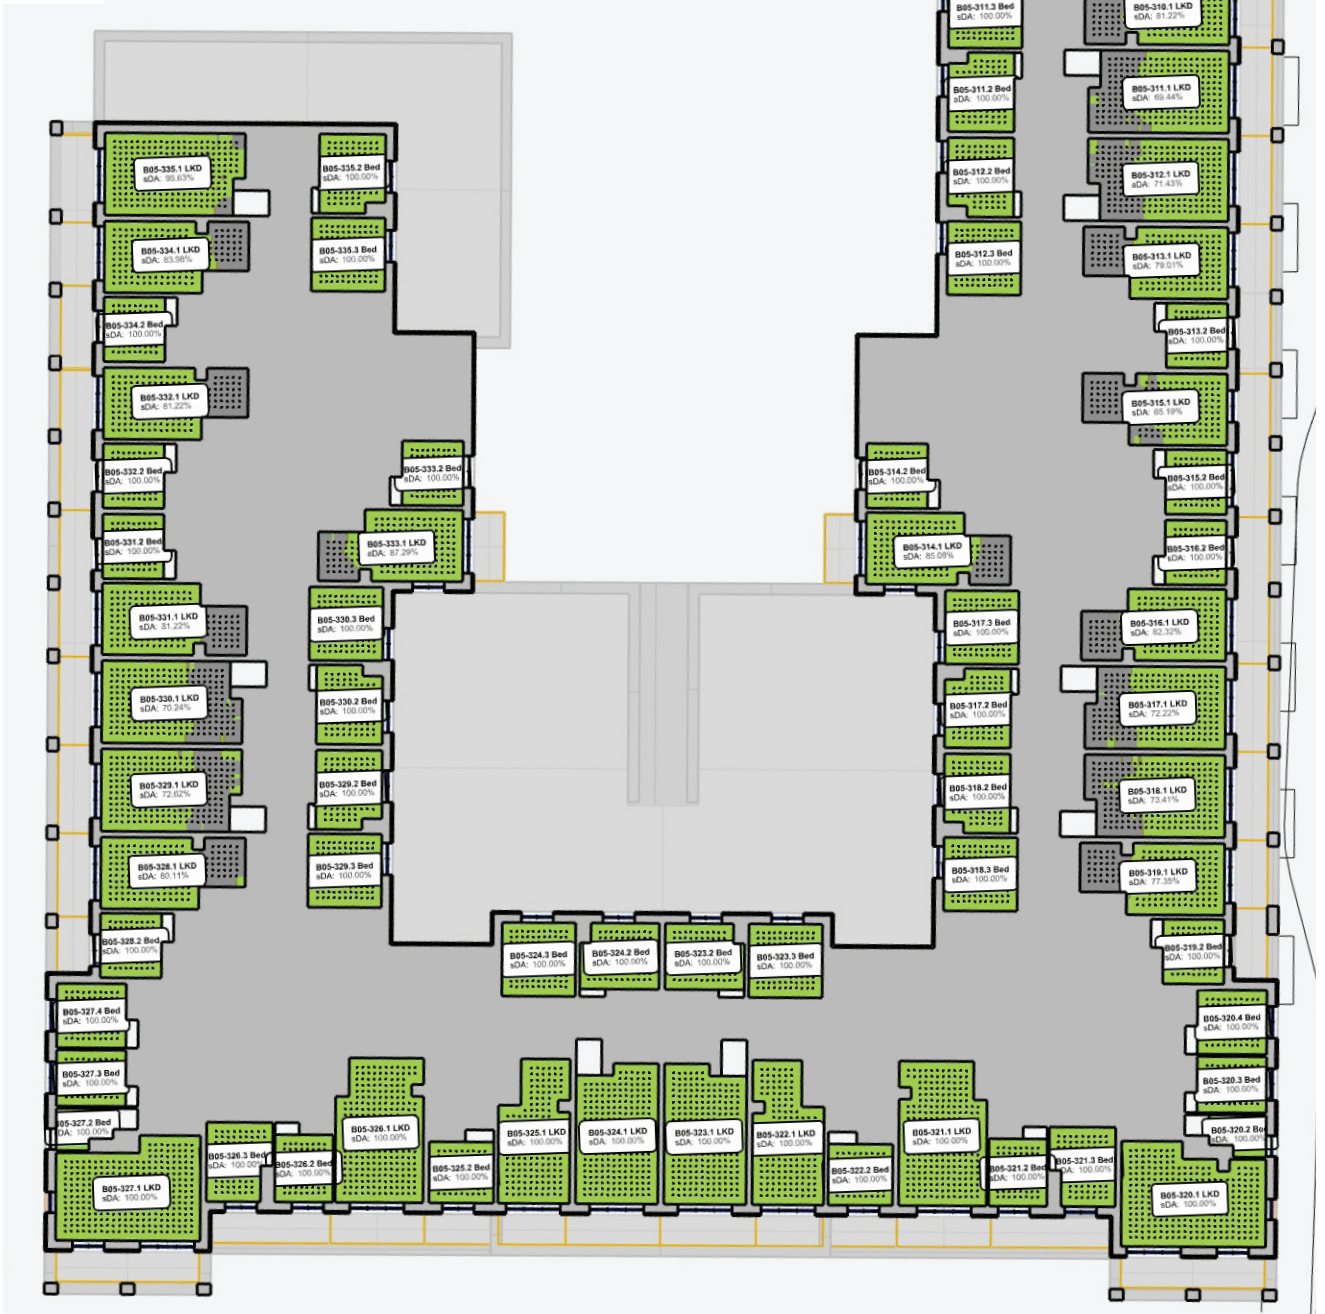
Site 5 - Floor plans indicating Daylight Provision to BS EN17037:2021+A1 Table NA.1
